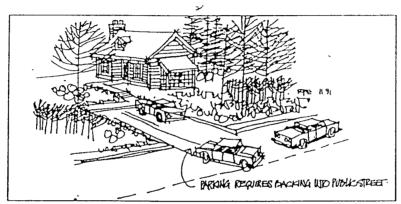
Off-street parking requiring backing onto major roads is discouraged.
